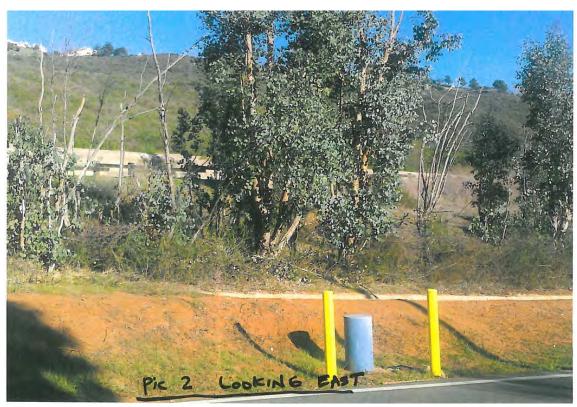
Figure F, Picture 2, Looking Easterly towards existing Vista Irrigation Flume
